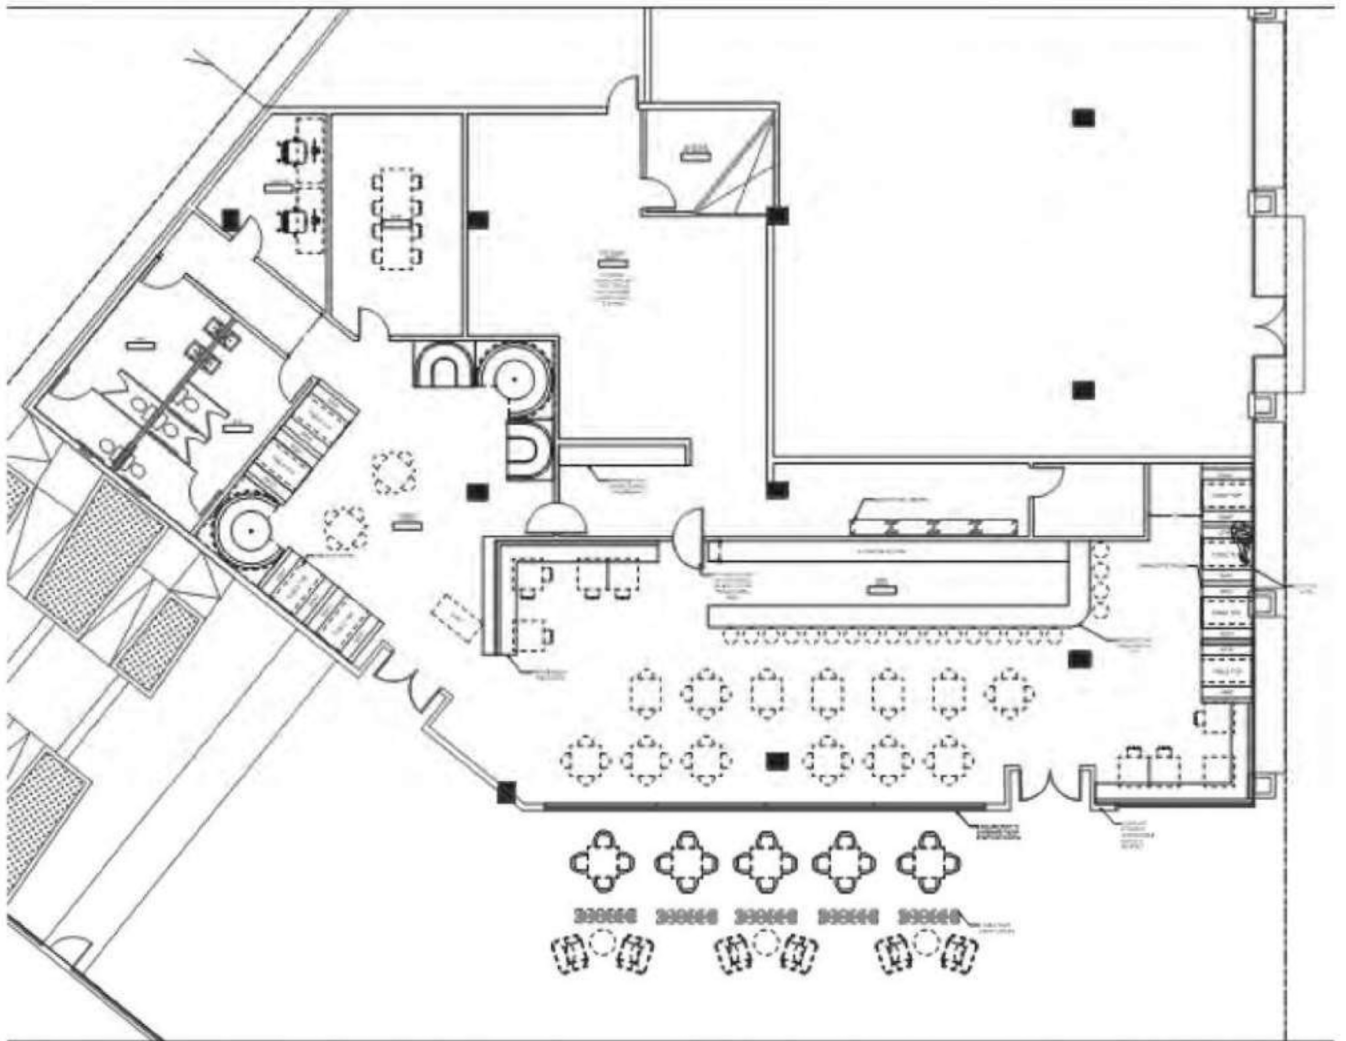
Exhibit F Summer 2020 – Interior space plan for new Taix restaurant. Sunset Blvd is plan Right, Reservoir St. is plan Left with the public paseo and outdoor dining at the base of the plan. Patrons can enter from one of two entrances off the paseo into the bar room or to the hostess desk, a small private dining room and right-sized kitchen utilize the upper portion of the plan.
